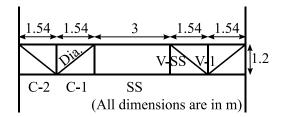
Truss configuration of STMF with single vierendeel panel in SS.
